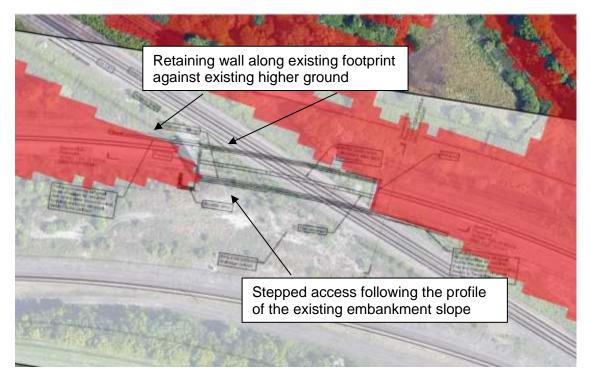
Cooper Intersection Bridge MV2/187 with 1%AEP+CC
